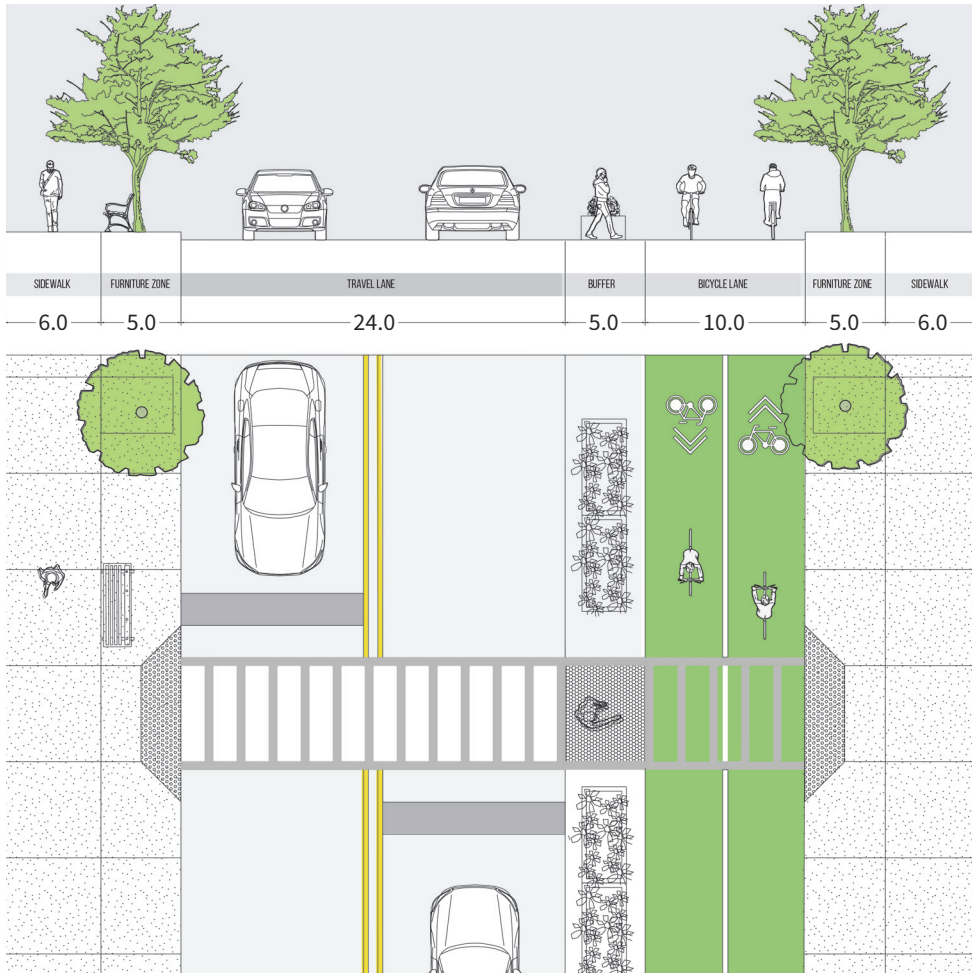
3. Typical Complete Streets section with crosswalk, showing the travel lane, biking facility, sidewalk, and furniture zone. Courtesy of BREC.
